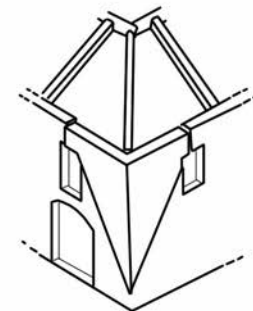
The rural building shows the corner collapse depends on the presence of quoins, on the layout of the opening and spanning direction of the roof, Faizzone village
